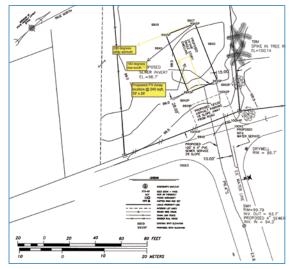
Site Plan. The site plan should detail the location, orientation, and the square footage of the proposed solar array area.
